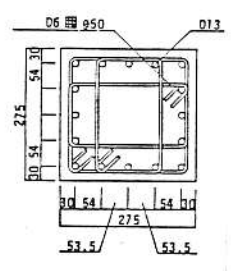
(Cont'd): Reinforcement Details of Specimen K2
